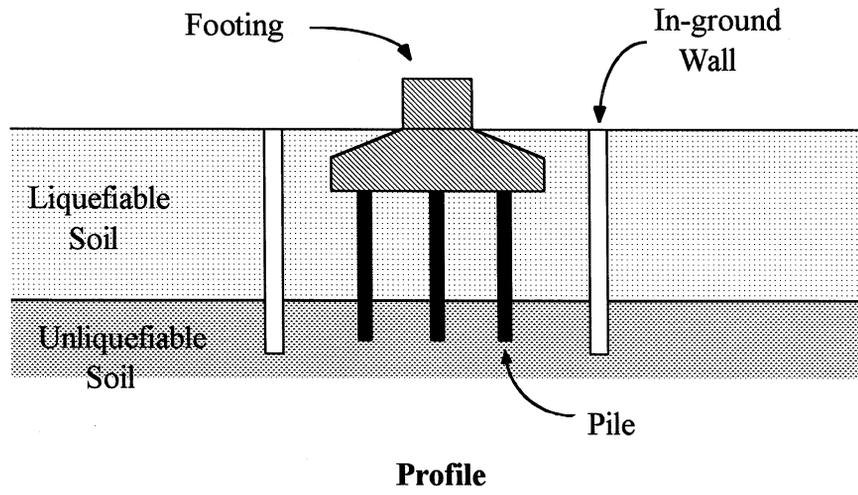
Mixed-in-Place Wall Around Pile-Supported Pier (after Kawakami, 1996)
